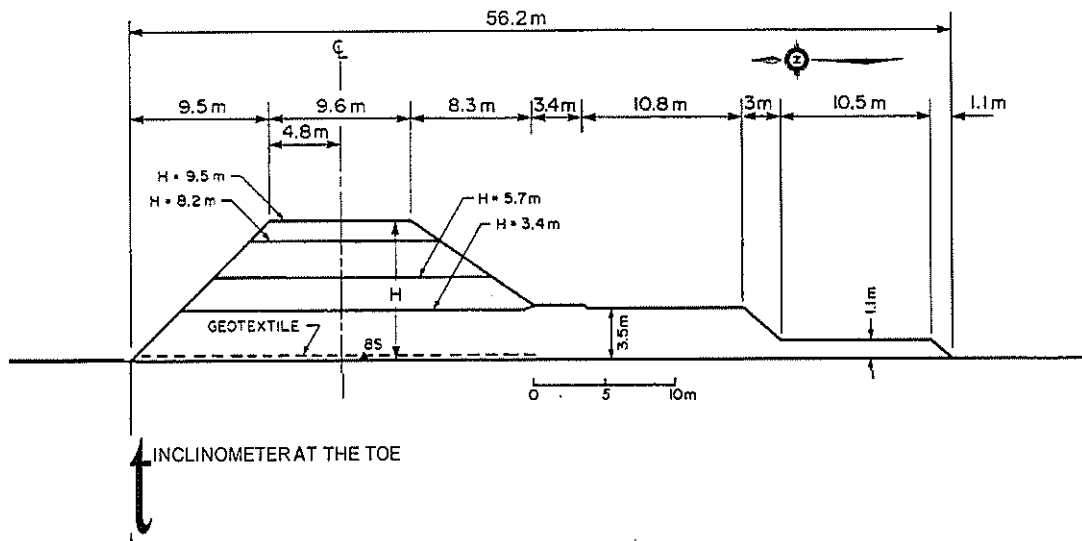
Details of the Sackville test embankment (extracted from Gnanendran, 1993)
